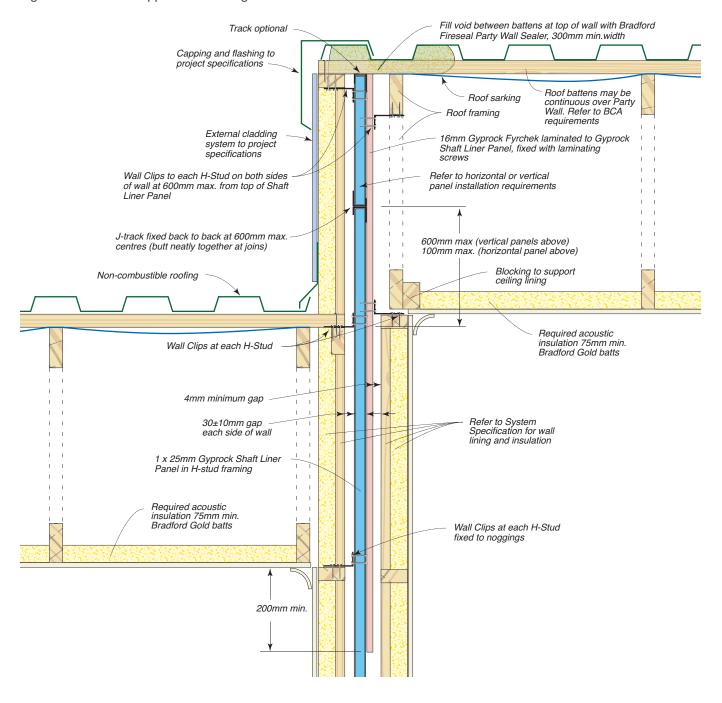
Roof With Party Wall To Underside Of Lower Roof Line
